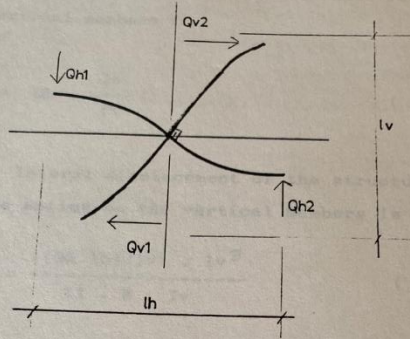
Shear forces acting on vertical and horizontal structural members of a joint in a framed structure.
